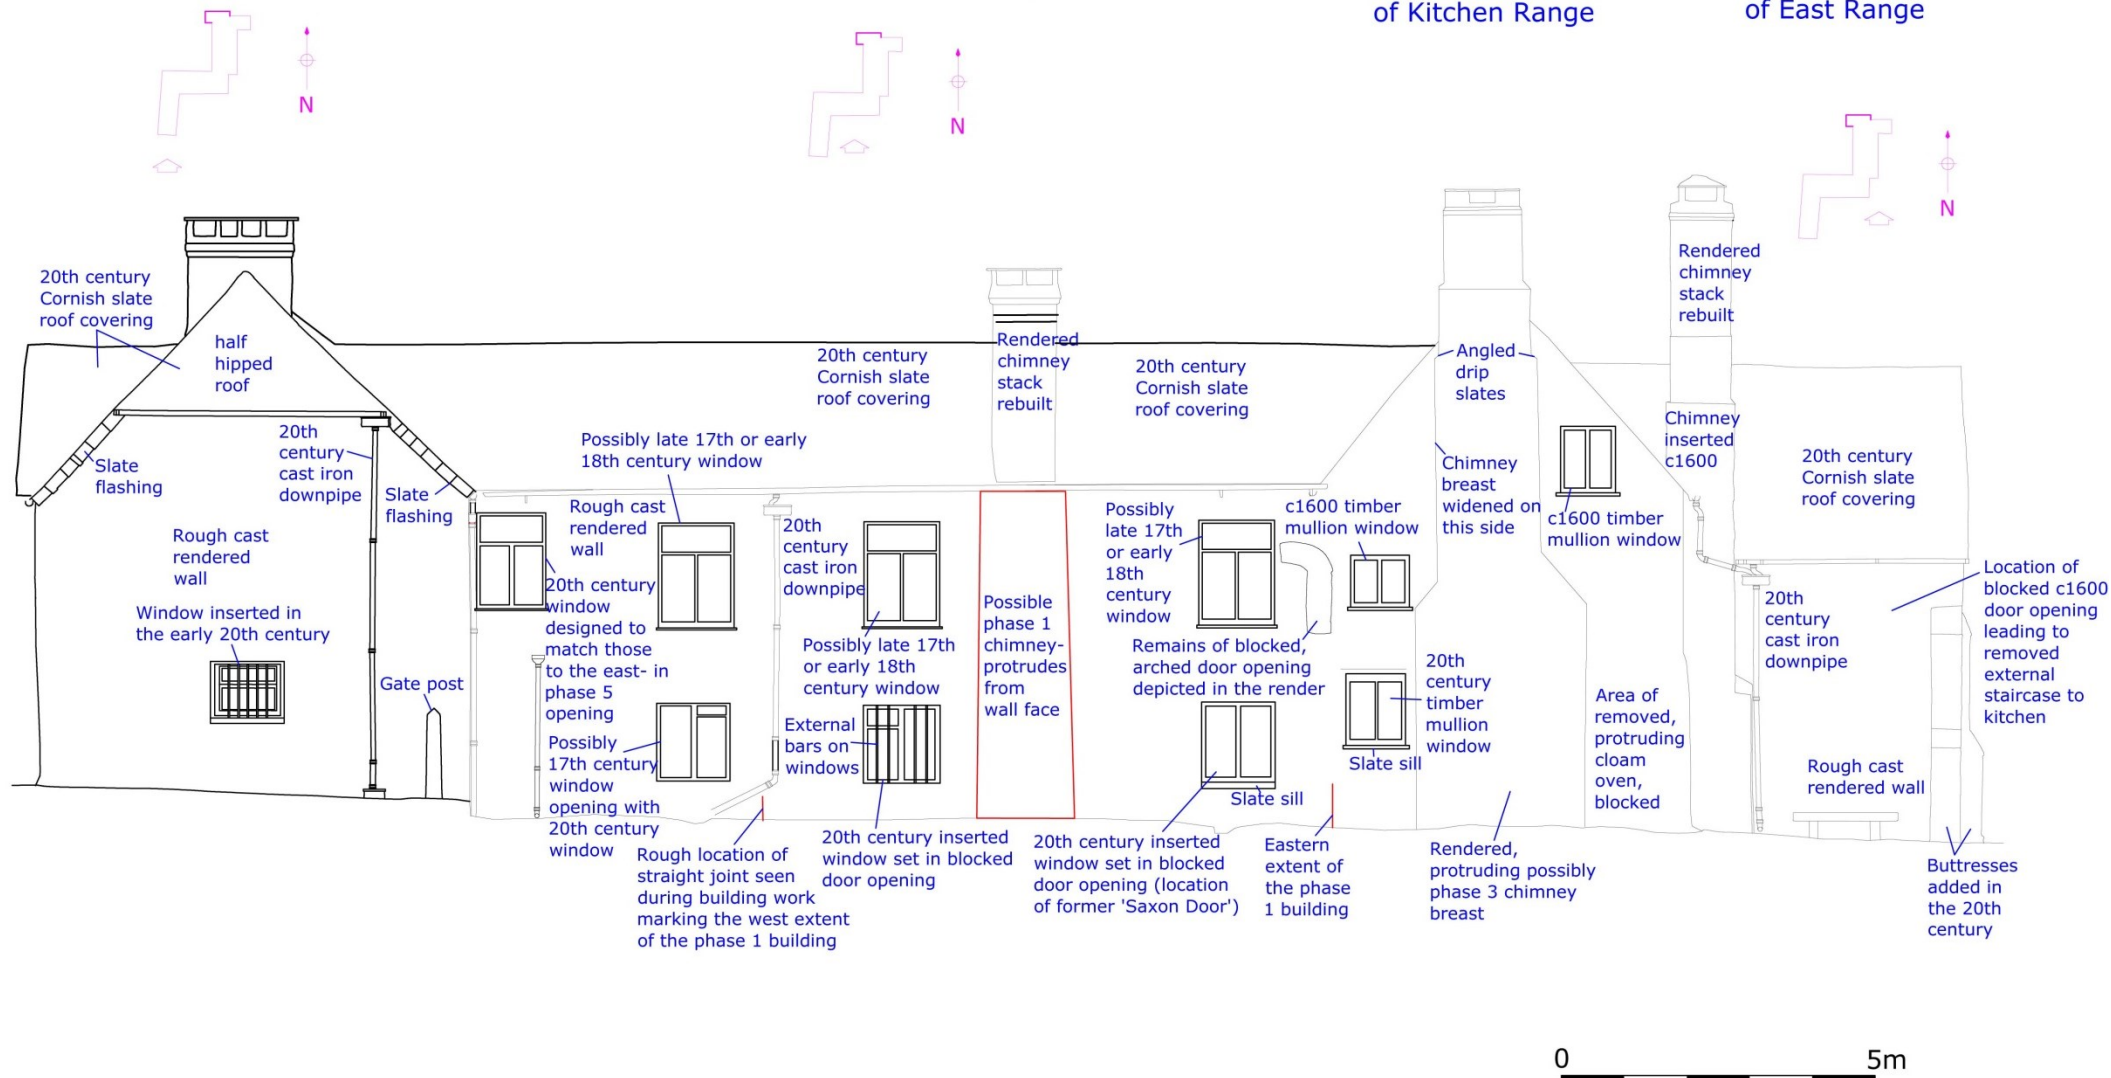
Manor House: South elevation of Barn Range, South Range, Kitchen Range and East Range
